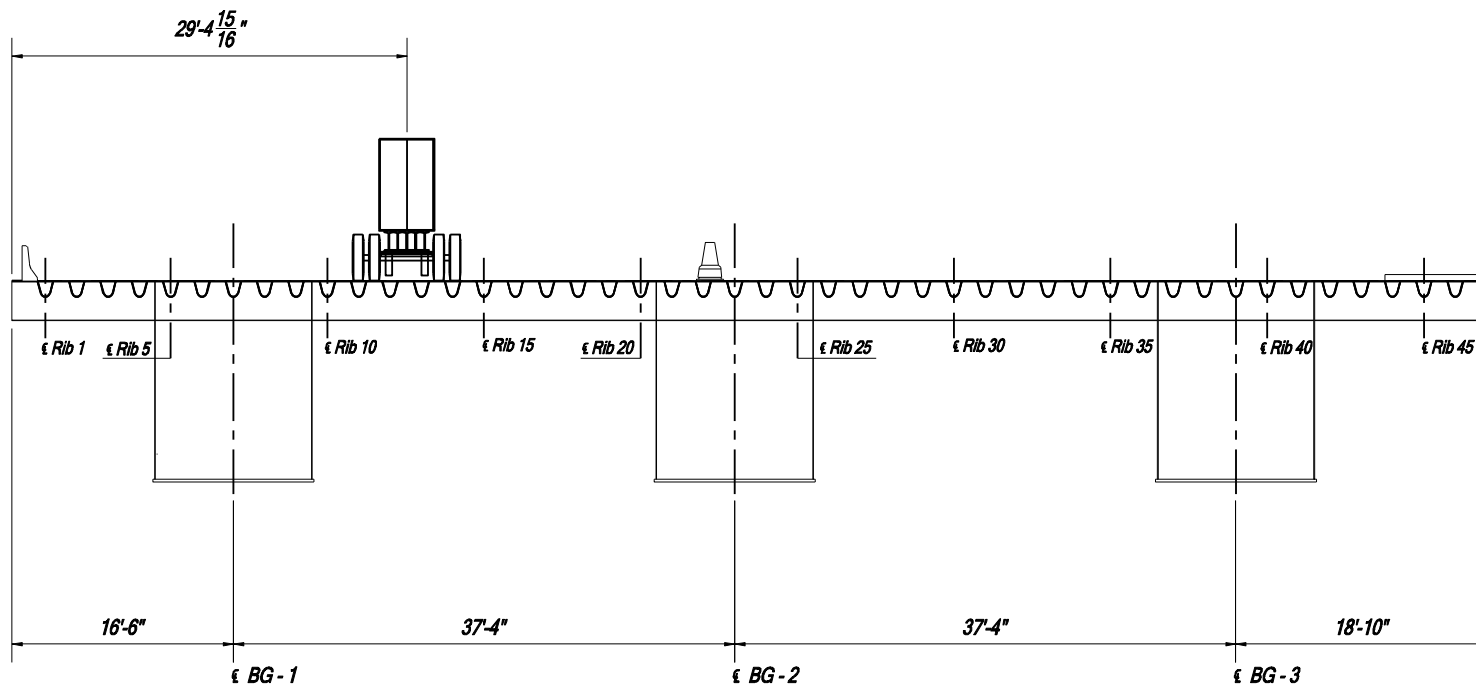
Transverse load position T33 considered for FEA of bridge deck
